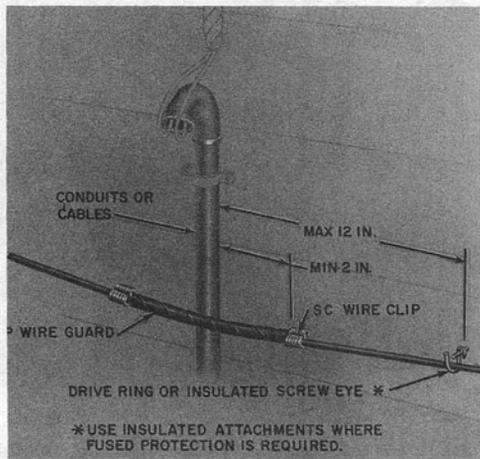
Wires Crossing Cables, Conduits, Signal, or Ground Wires on Wood, Stucco, or Metal Siding
